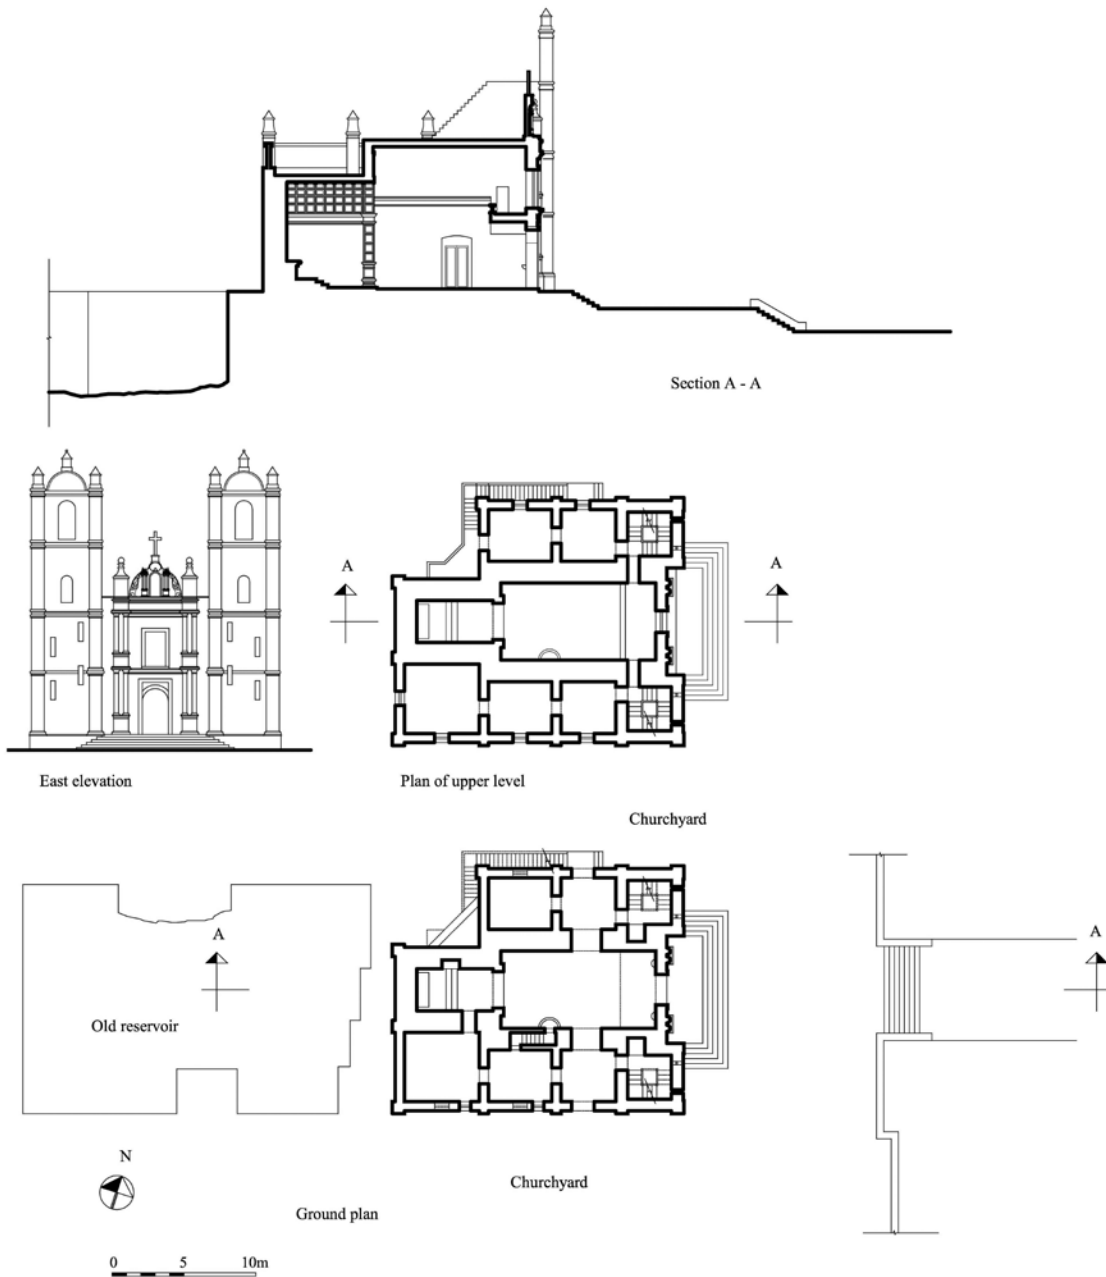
Fudam, Church of Our Lady of Remedies (12), ground plan also showing the outline of the old reservoir behind the church; plan of the upper level; east elevation and longitudinal section A-A.
